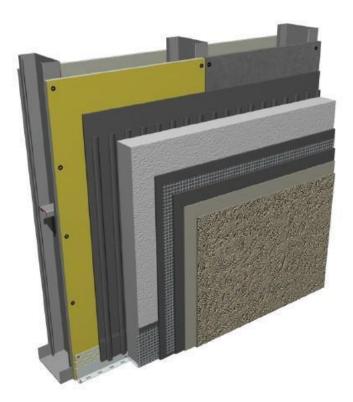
"InsulROCK EIFS" with moisture barrier over glass-fibre-faced gypsum sheathing and cement board
